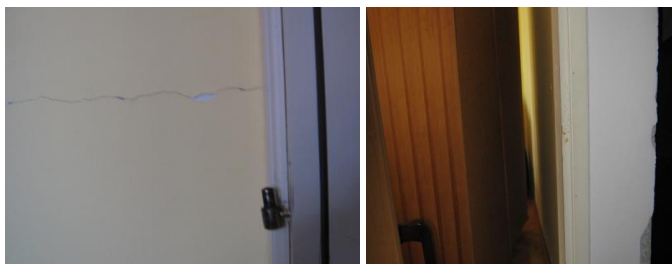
Partition wall crack and bedroom door rotation caused by blast's air wave
